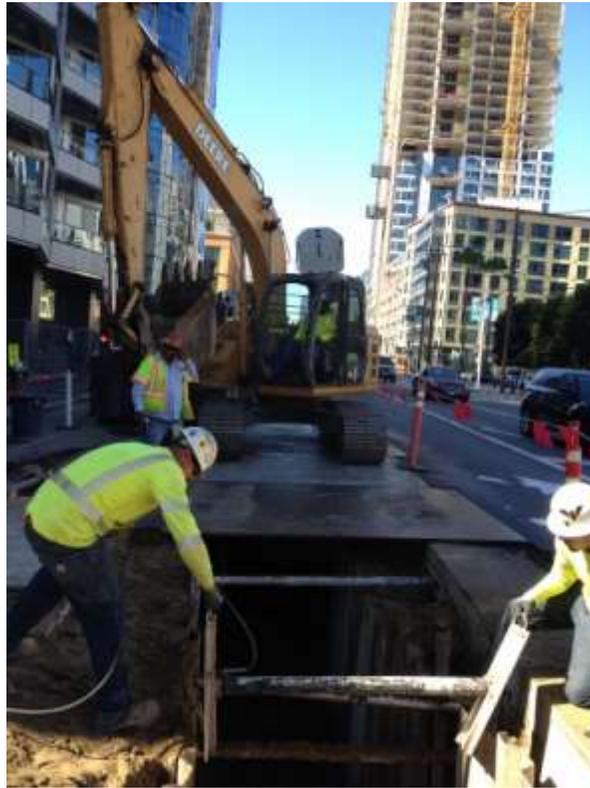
Excavating duct bank trench on Folsom Street between Beale and Main Streets. View south, September 8, 2015.
